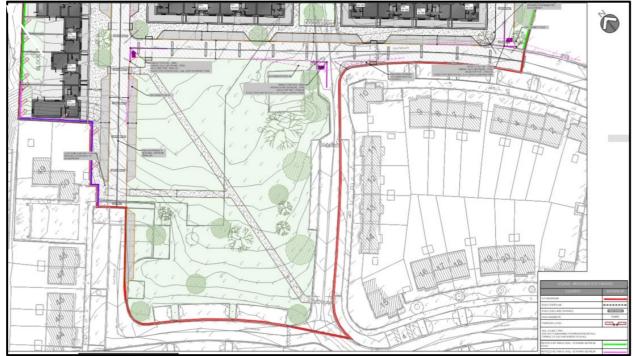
Proposed site layout. (Sheet 2 of 2). (Source: SDS Design Engineers).
